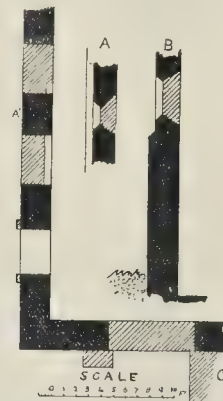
Plan of Old North Wall at Lydd, Kent: N.W. Corner of North Aisle.
